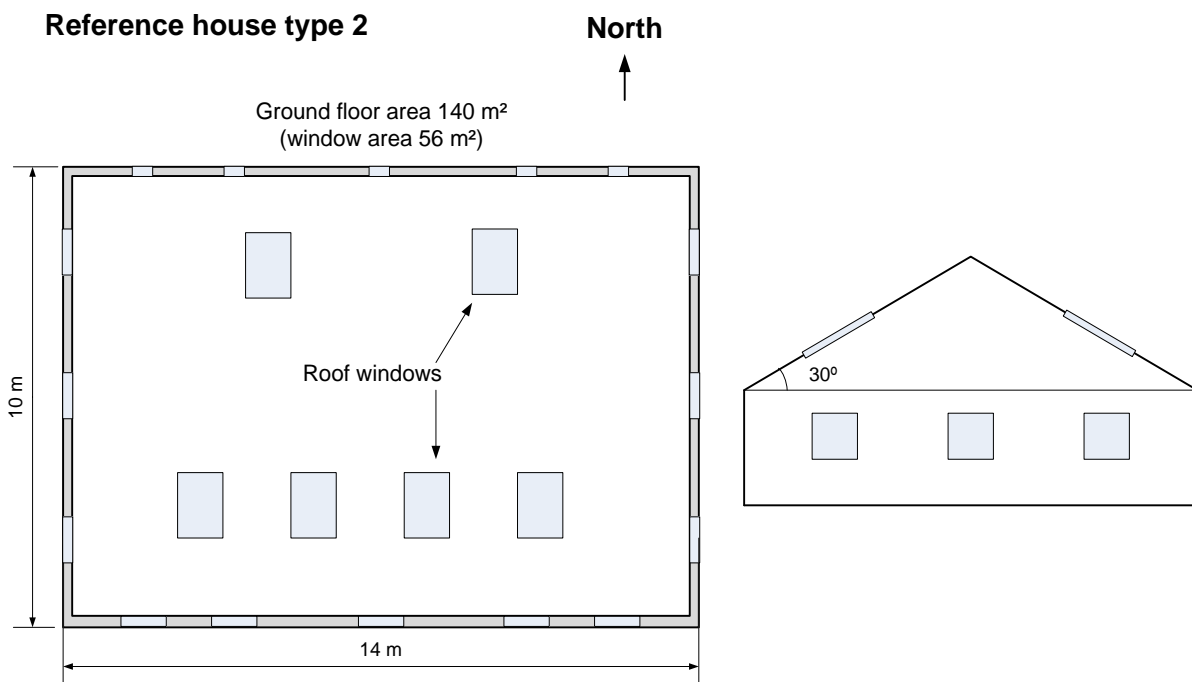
Outline of the reference house type 2 with 30° sloped roof construction
